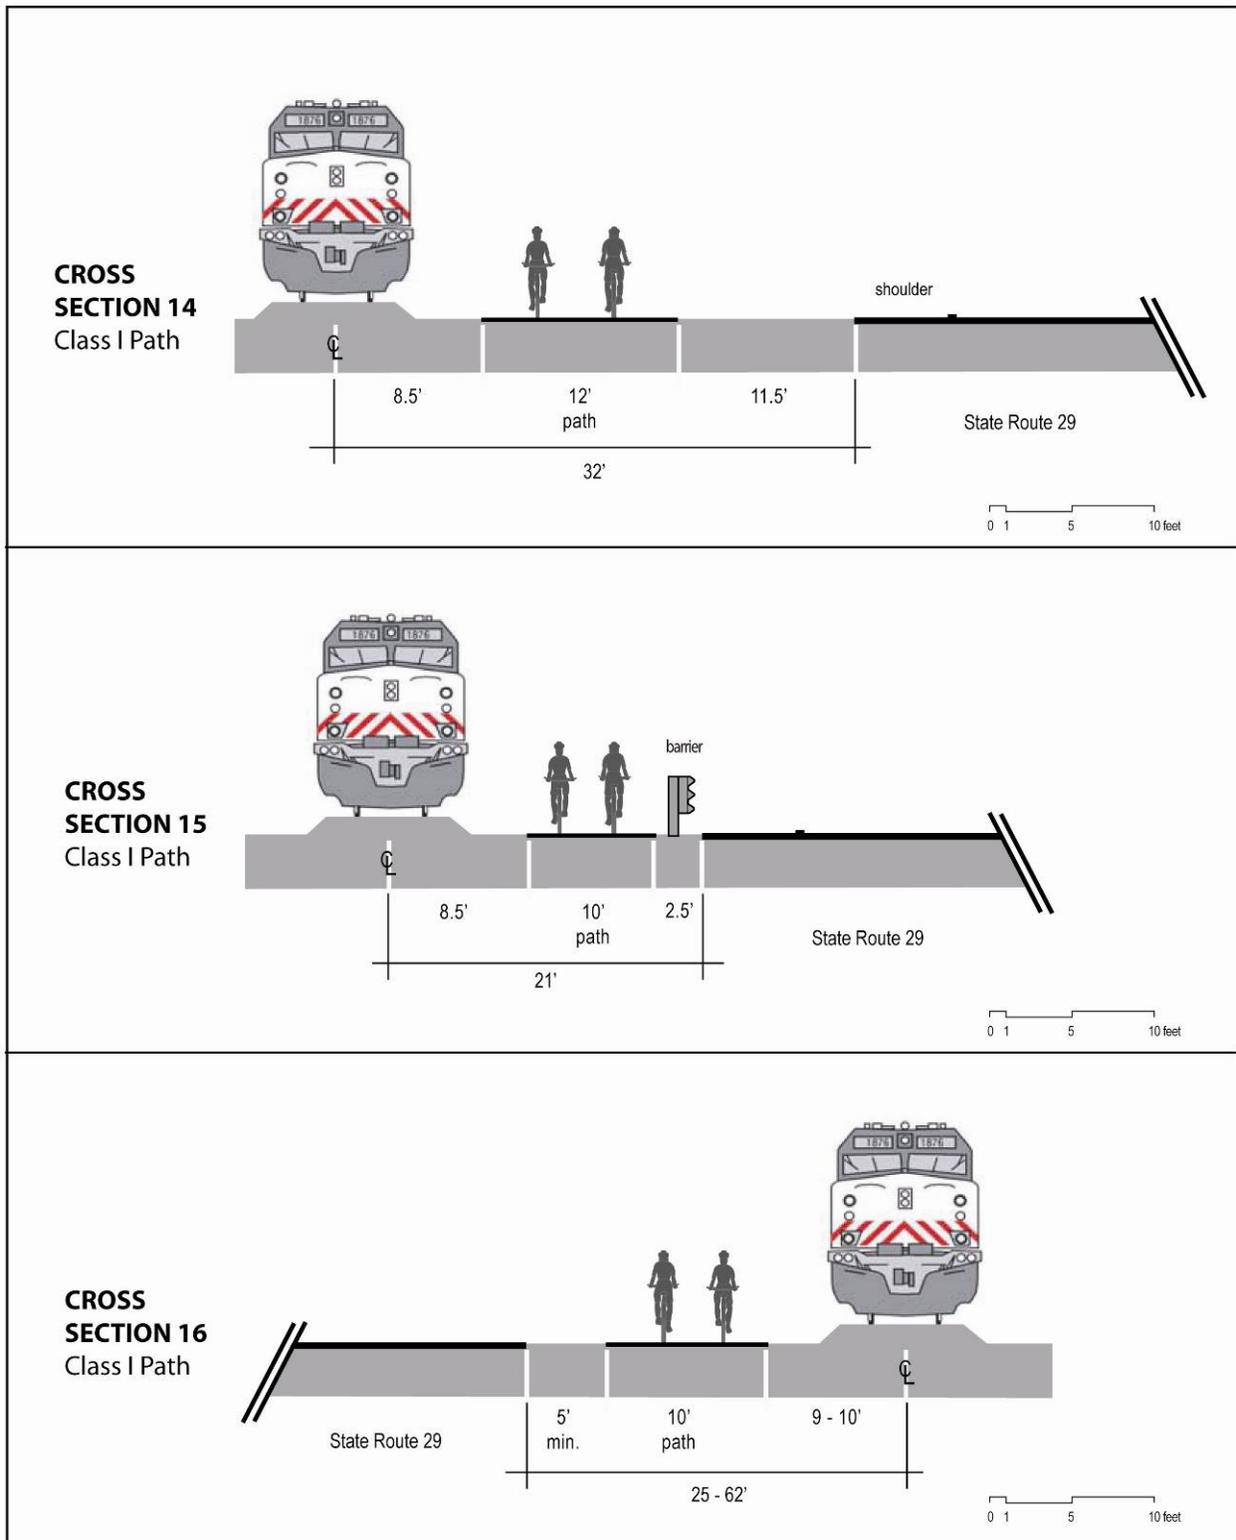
Napa Valley Greenway Typical Cross Sections
